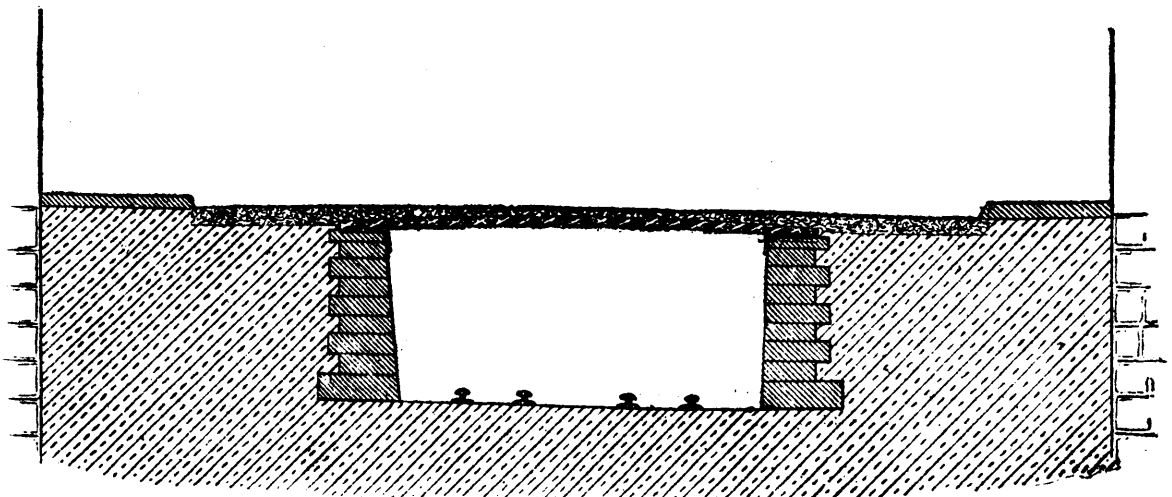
WOVEN-IRON COVERED SUNKEN RAILWAY.
